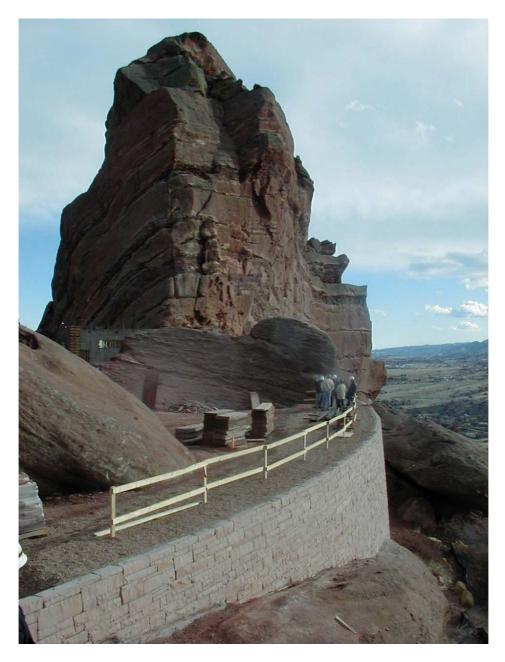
The MSE wall follows the natural topography in an arc facing Mt. Morrison to the west.
